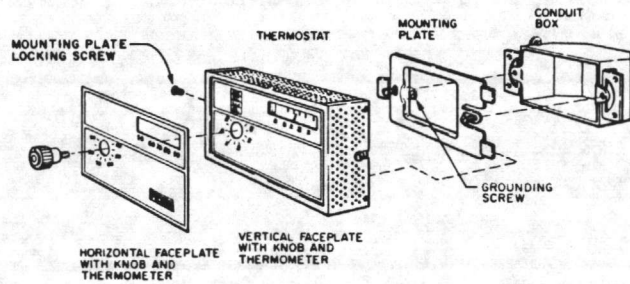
Line drawing illustrating method of mounting a vertical thermostat to a horizontal outlet box and installing a horizontal faceplate.
